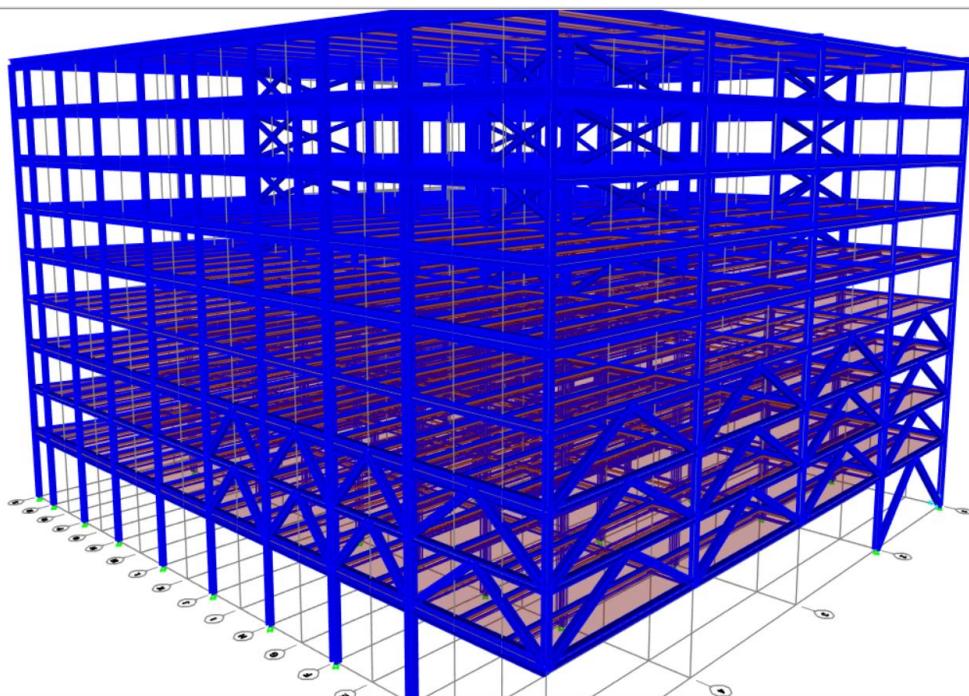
Global Structural Model for Proposal 2 (SAP2000)
